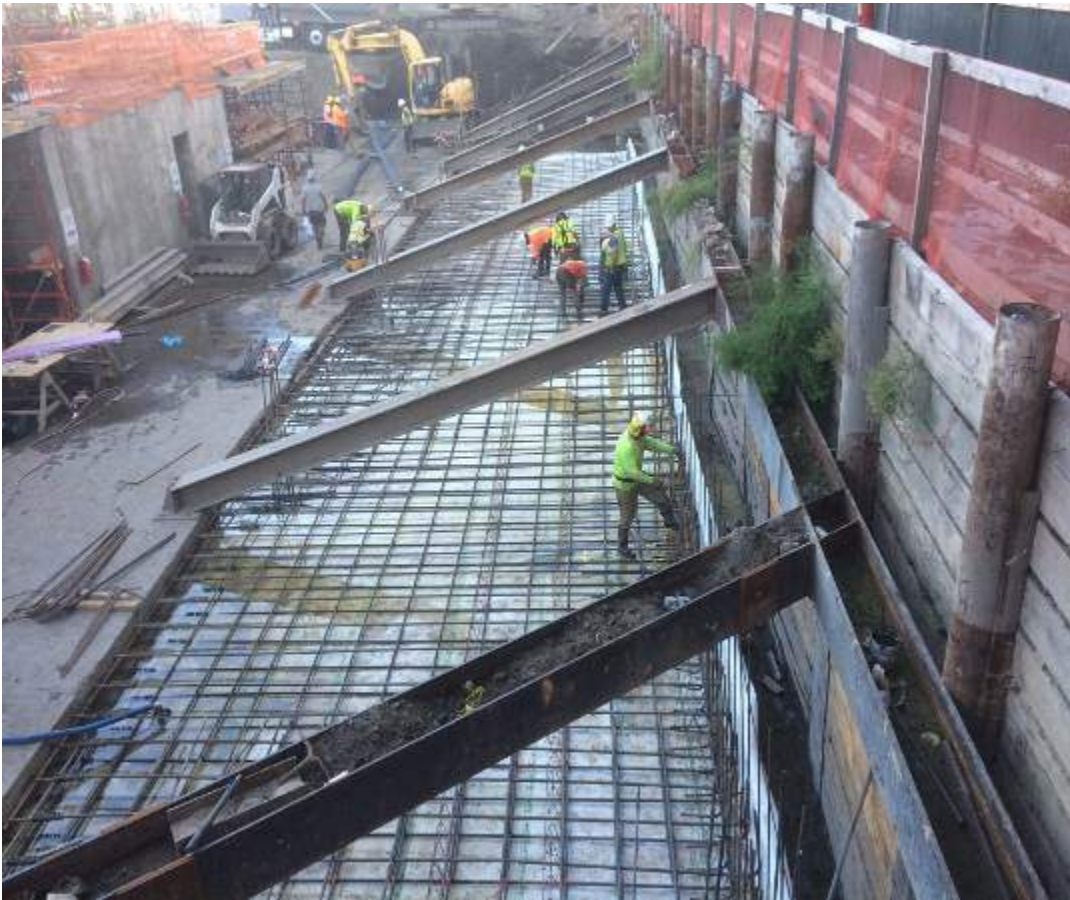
View of the contractor installing the first floor in the southeastern and central portions of the Site, facing southeast.
